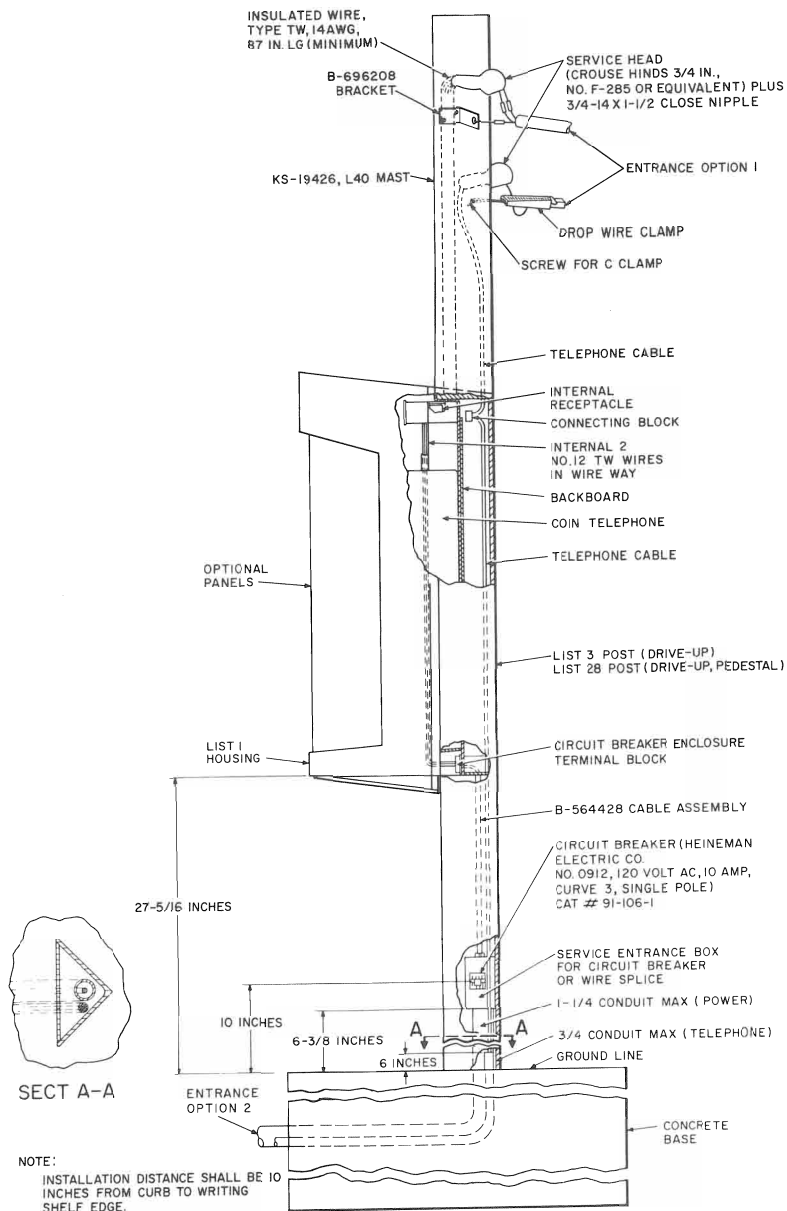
Installation Requirements for Post or Pedestal Mounting, Drive-Up Location
